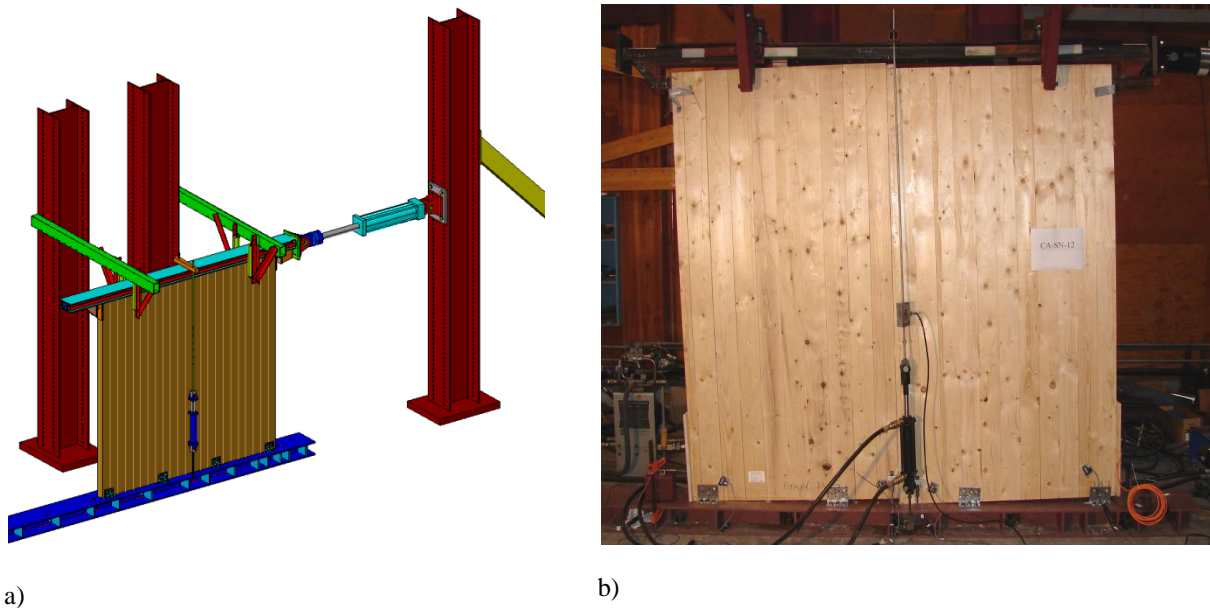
a) Sketch of the test setup used for CLT walls; b) CLT Wall 12 during testing
